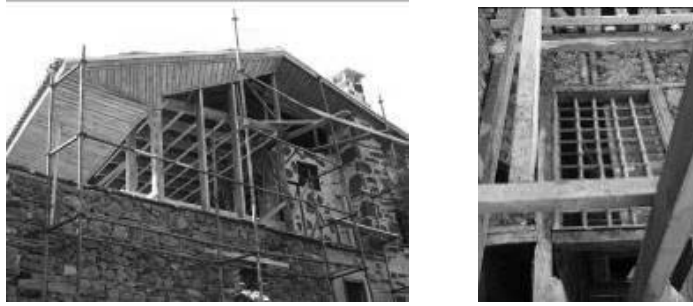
Gödeliler House- Structural Elements of Timber Framed Structure (Ozgul Yılmaz Karaman 12.10.2008)
